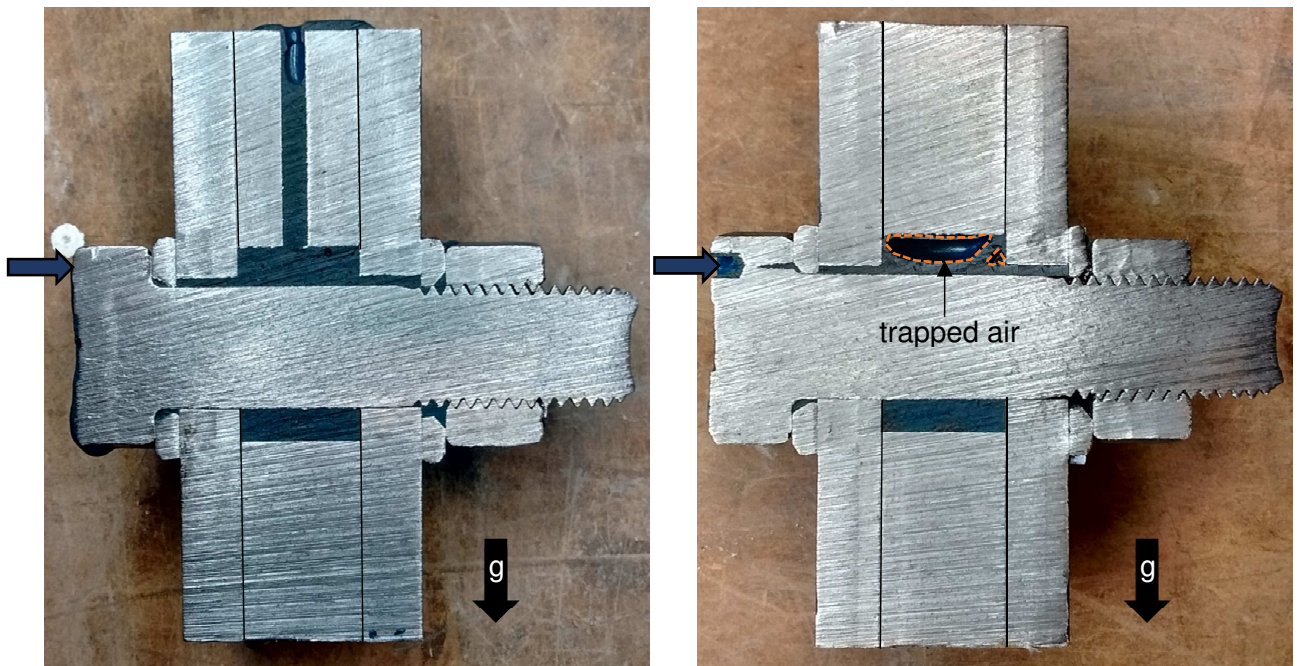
Cross-section of a resin-injected double lap shear connection with (left) and without (right) air escape channel. Bolts are M20, diameter of cover plate hole 22 mm and centre plate hole 32 mm.
